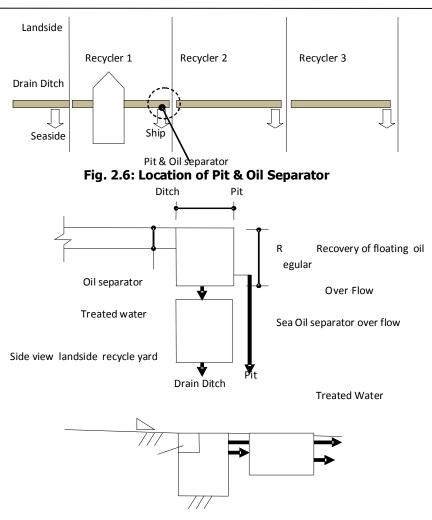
Pit and Oil Separator Detail (Top View)
